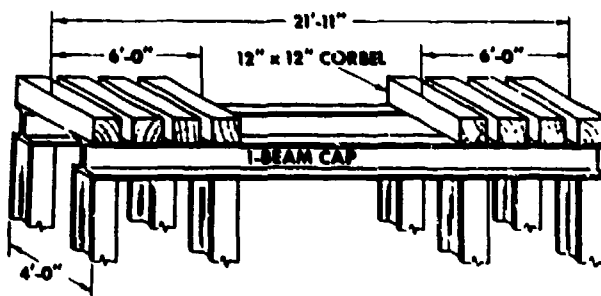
Construction of pile caps to provide seating for bearings at adjacent ends of independent spans-steel piles and caps.
